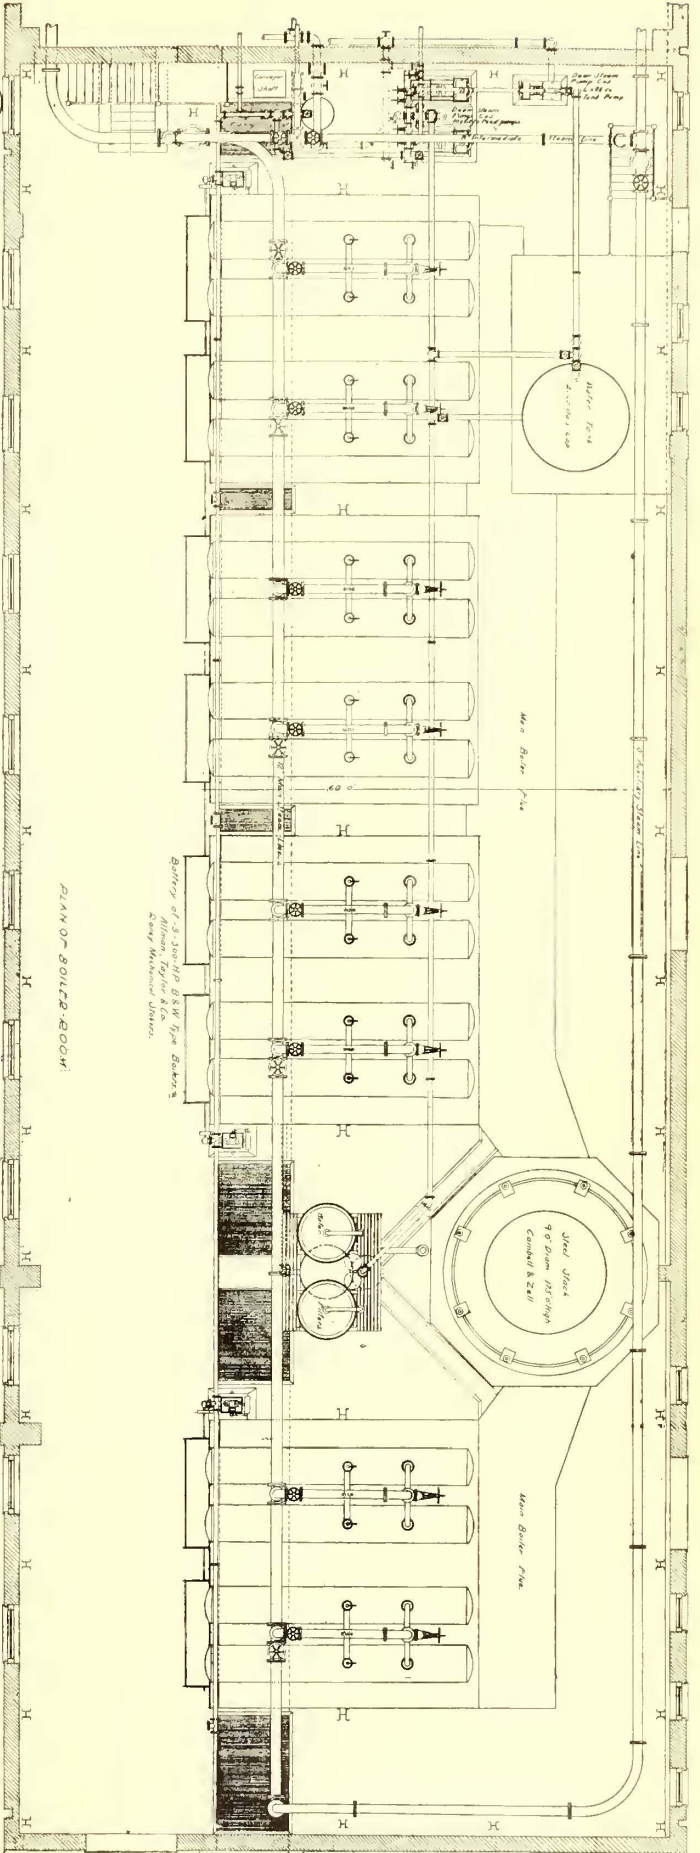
PLAN AND SECTION OF BOILER ROOM—CAPITAL TRACTION CO.
